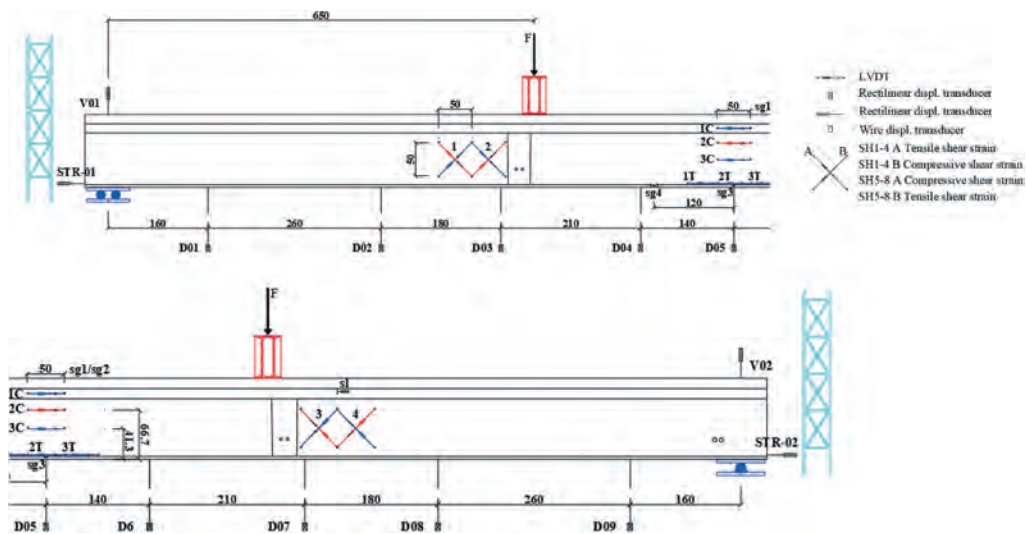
Layout of the testing system with measuring devices for girder BX2-Ab/P47 (units in cm).
